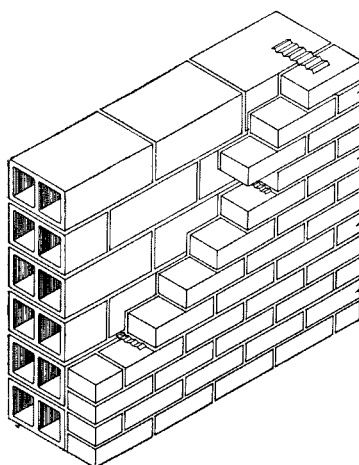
Brick veneer construction (from National Fire Proofing Co., Builders Handbook of Natco Hollow Tile Construction, 20).
